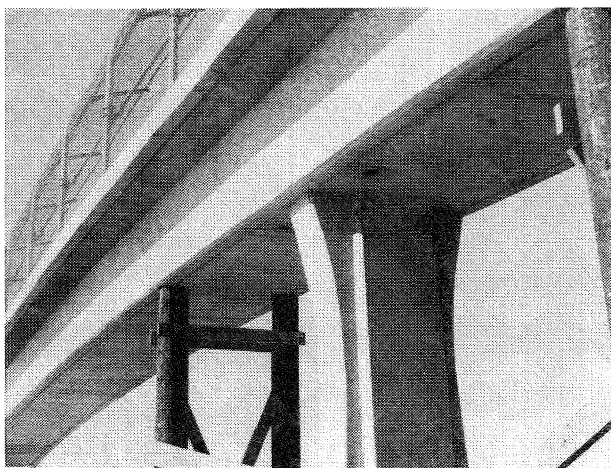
Spalling of the top of the tallest column. Tyler Street Pedestrian Overcrossing
